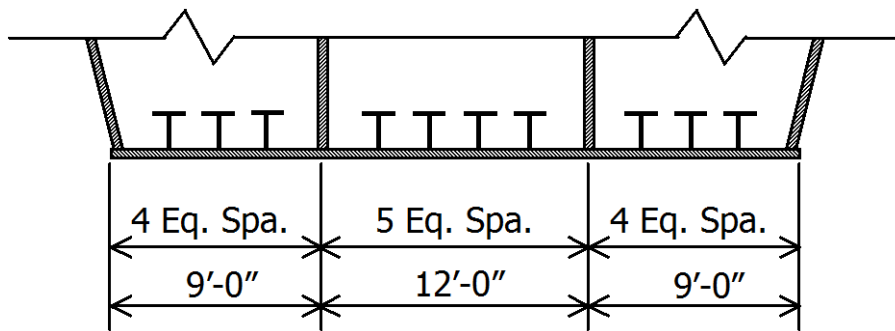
Longitudinal Stiffener Arrangement, AASHTO Design
